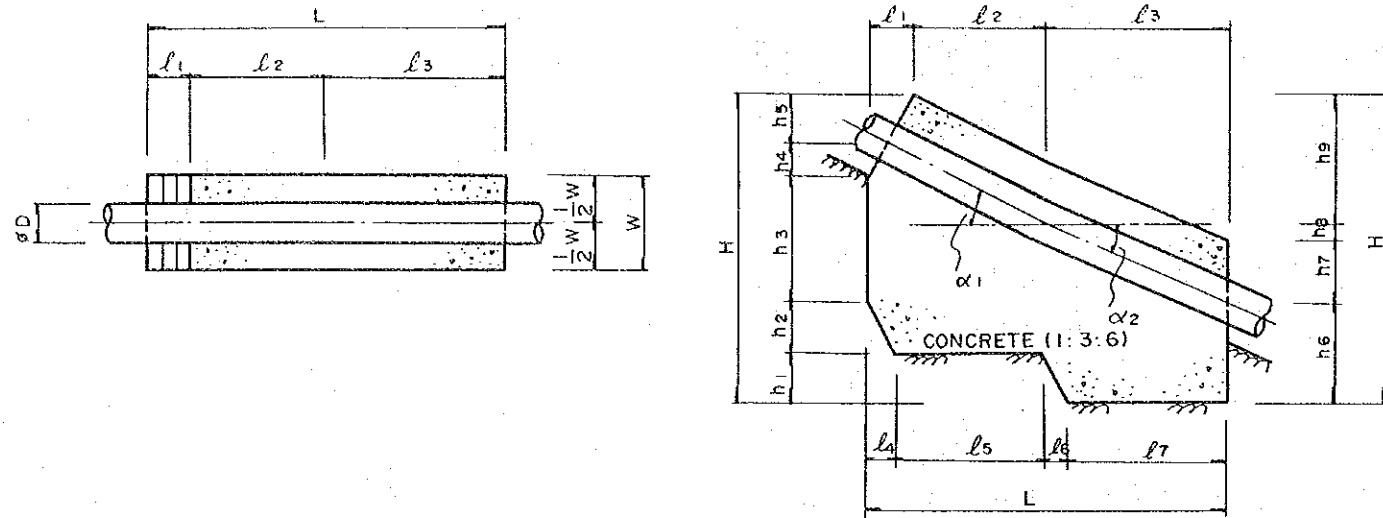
DETAILS FOR PENSTOCK ANCHOR BLOCKS
